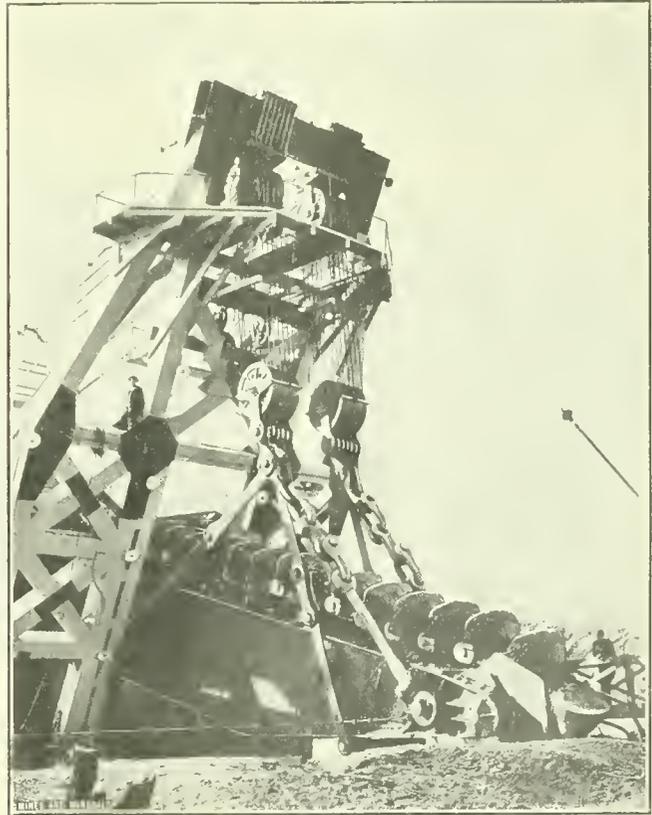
SIDE VIEW OF DREDGE BUCKETS
